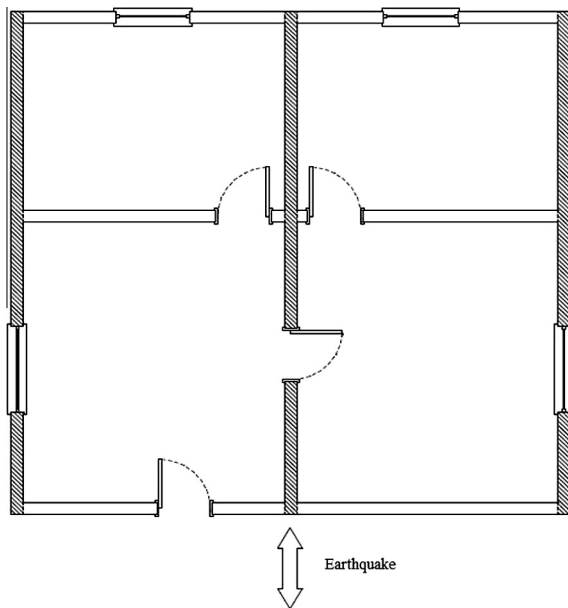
Masonry walls in storey plan, l_d : total length of the shaded area, A : gross storey area [33].
